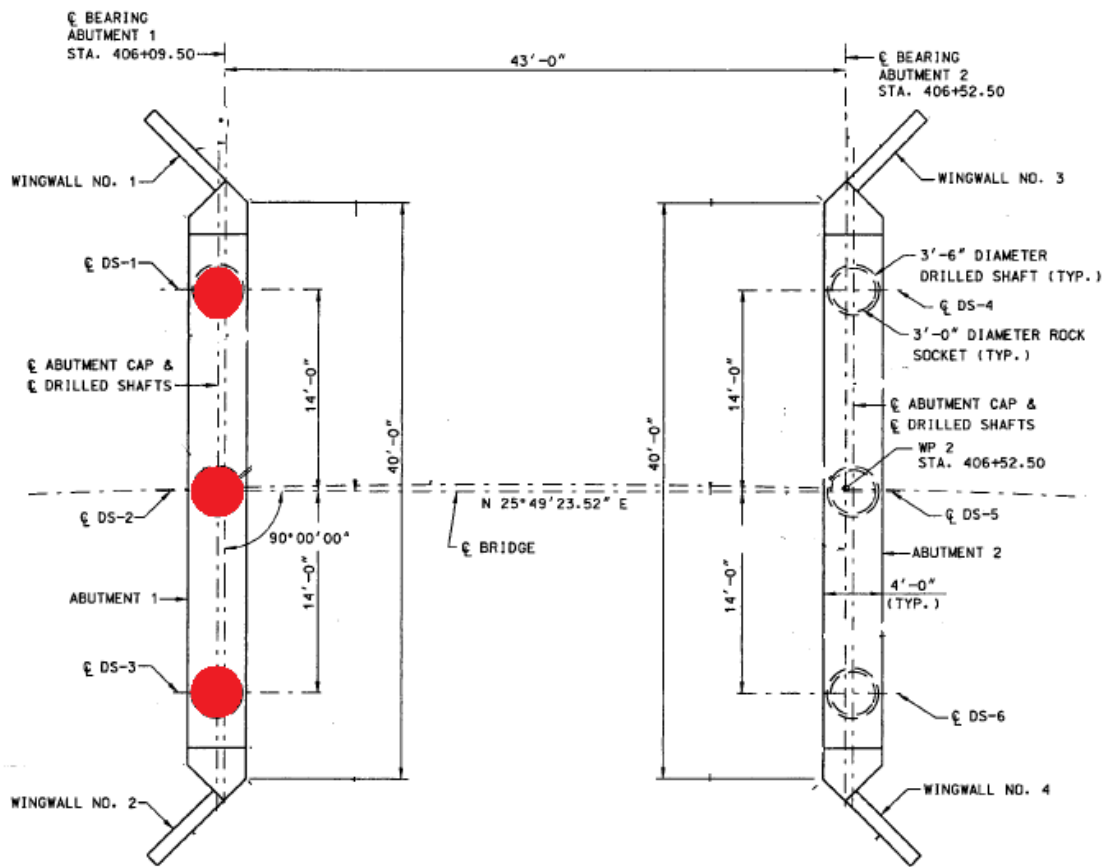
Plan view of Stalnaker Run replacement abutments, from construction plans. Shaded areas indicate caissons constructed using SCC.
